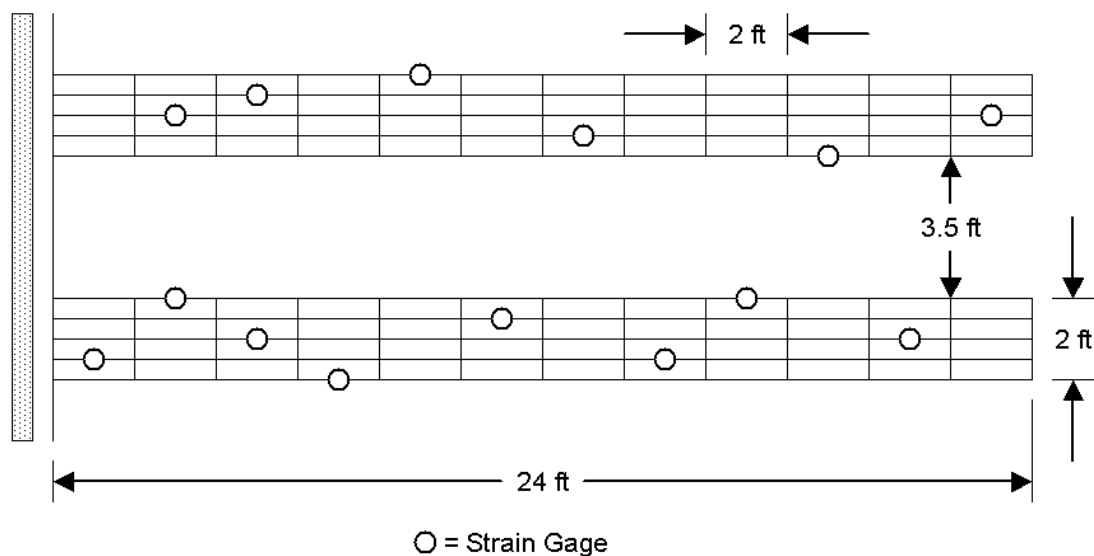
Plan view of instrumented bar mat 5W20-24 at level 1.
